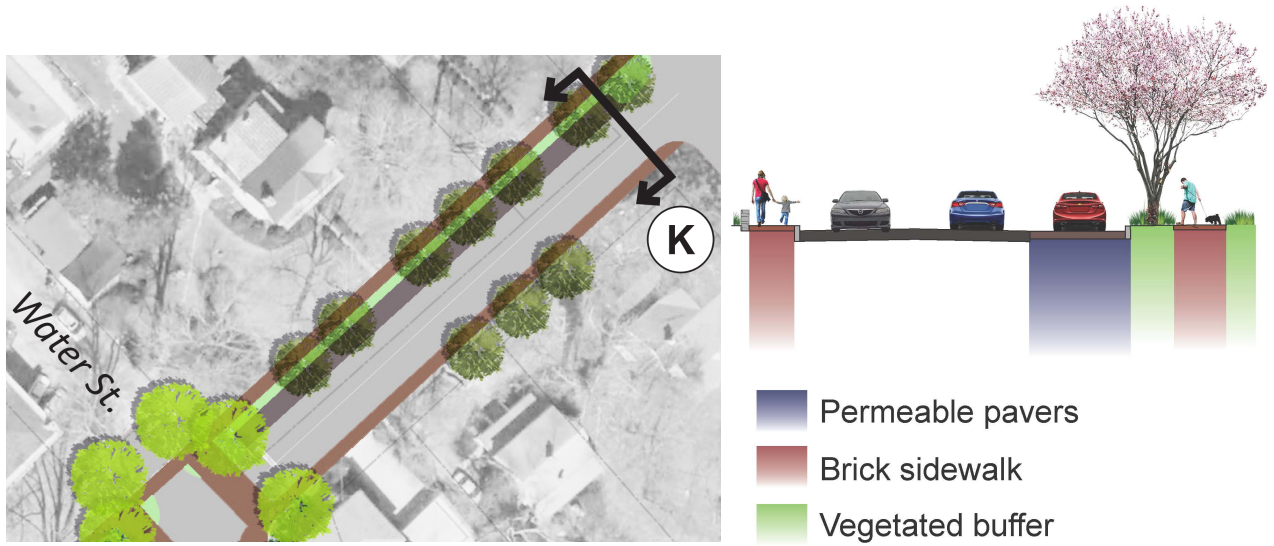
Market Street in town showing how the on-street parking areas also function for stormwater management by utilizing engineered soil below the pavement
